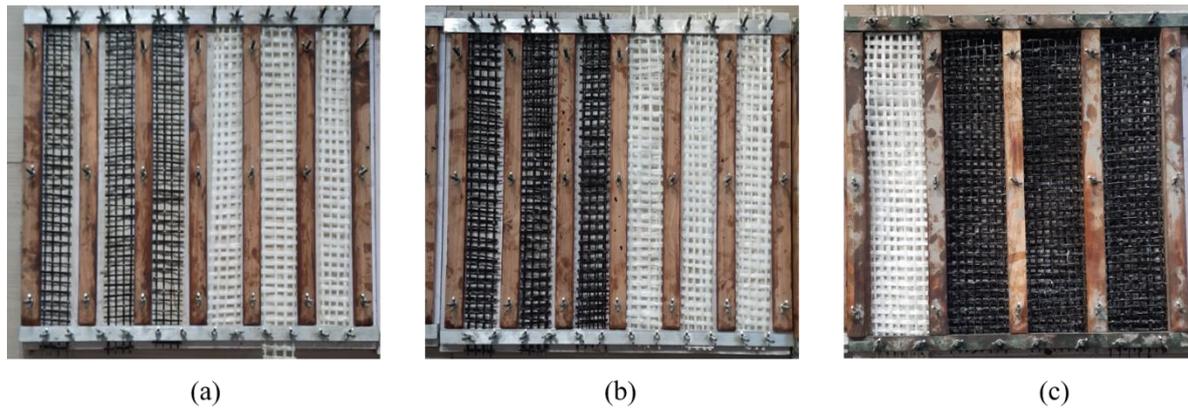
Formwork for casting plate specimen with: (a) one layer of fabric for pull-out test specimens, (b) two layers of fabric for uniaxial tensile test specimens, (c) three layers of fabric for flexural test specimens.
